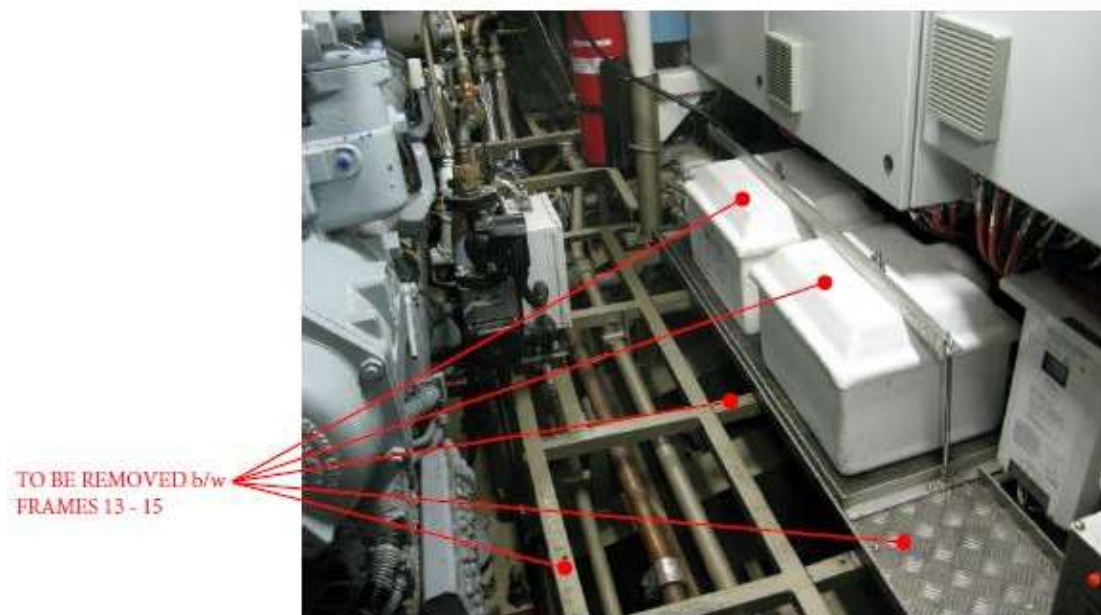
Main Engine Room- view of outboard (Port) engine support girder. Battery packs, steel floor plate and floor support structure to be removed.
